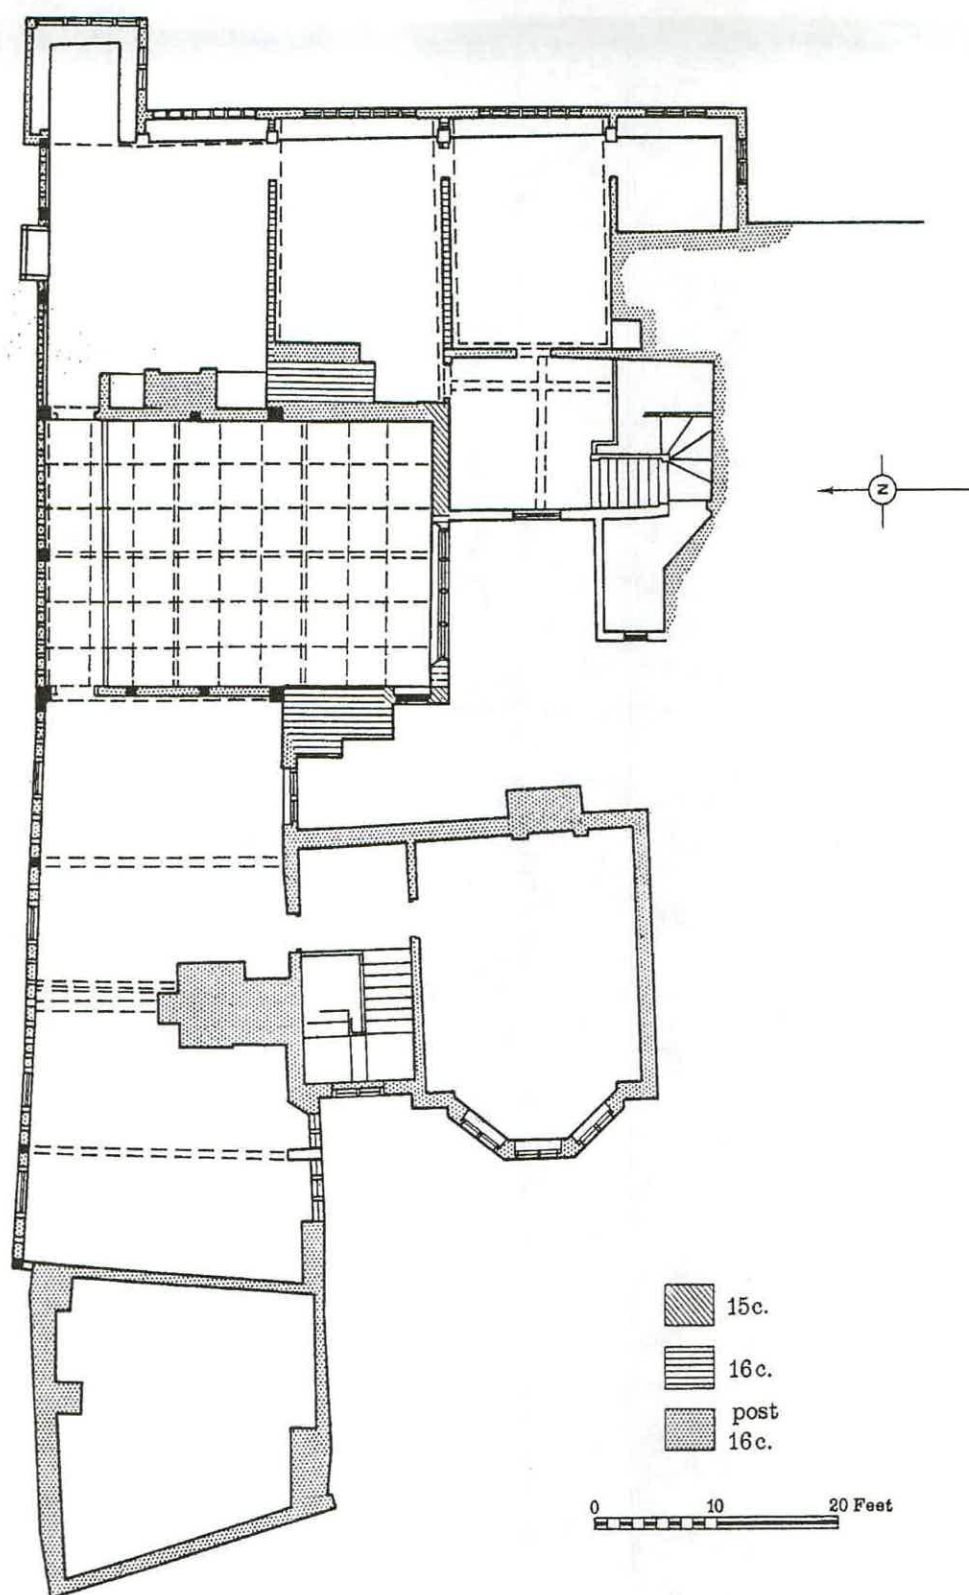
, the plan of the first floor of Tudor House (Faulkner, 1975, fig. 32)
